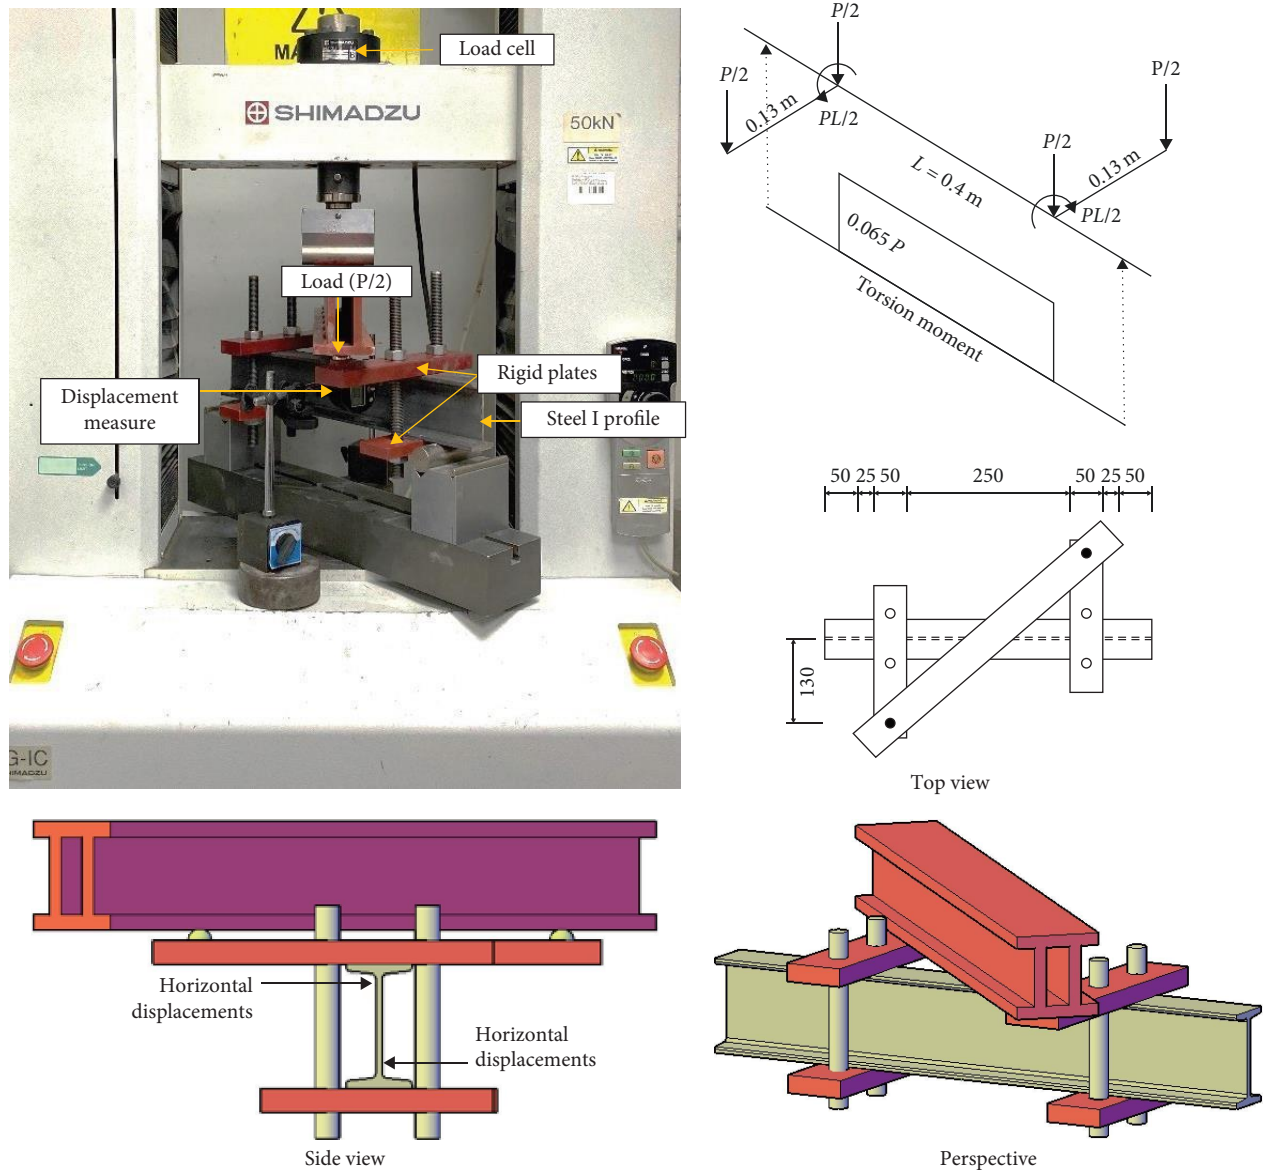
The test setup of steel beams subjected to torsion (units: mm).
